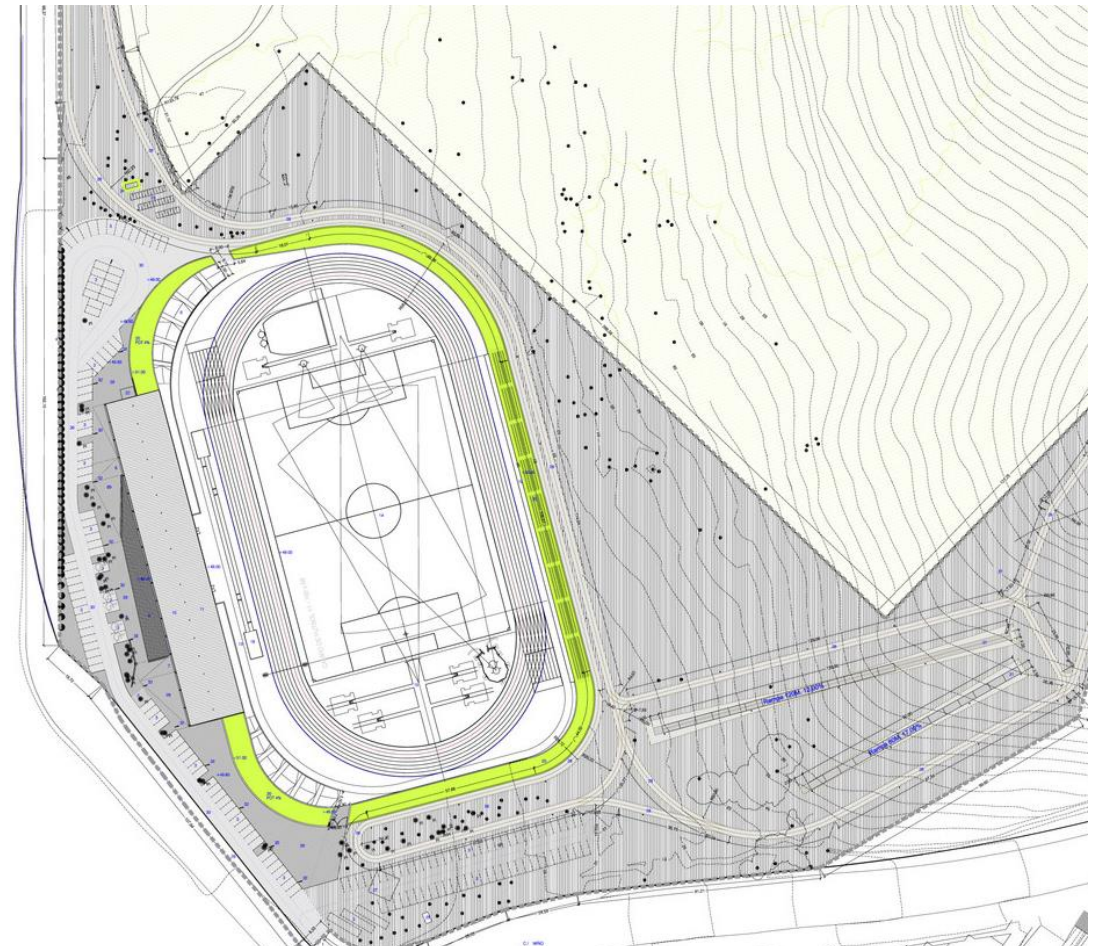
Site Plan of Calvia Running track. Showing the scale of this typology of facility. (Niu Architects, 2013)
